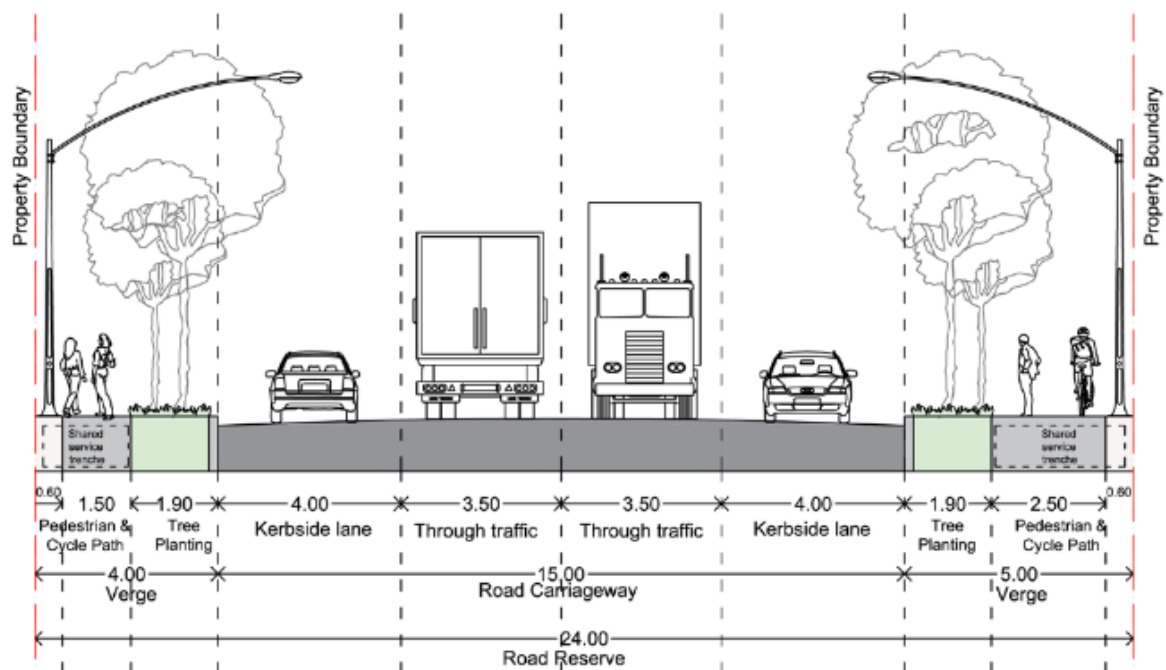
Industrial Road Cross Section- Draft Mamre Road DCP
